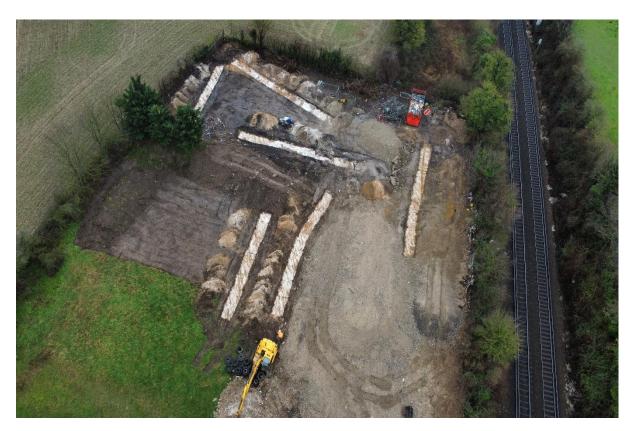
Arial (oblique) photograph of the site following the excavation of evaluation trenches
